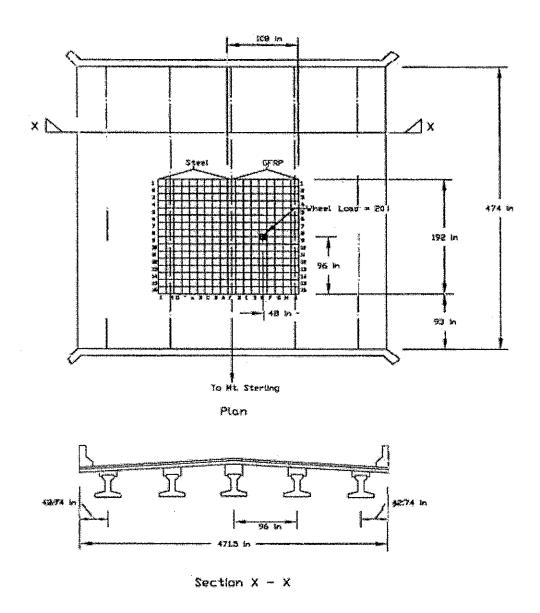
Location of GFRP Reinforced Grids on the Bridge
